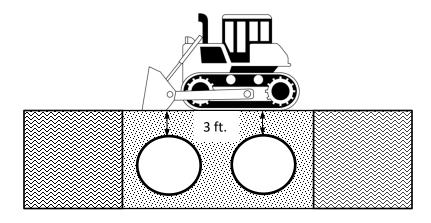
Minimum Cover to Allow Construction Traffic over Pipe
